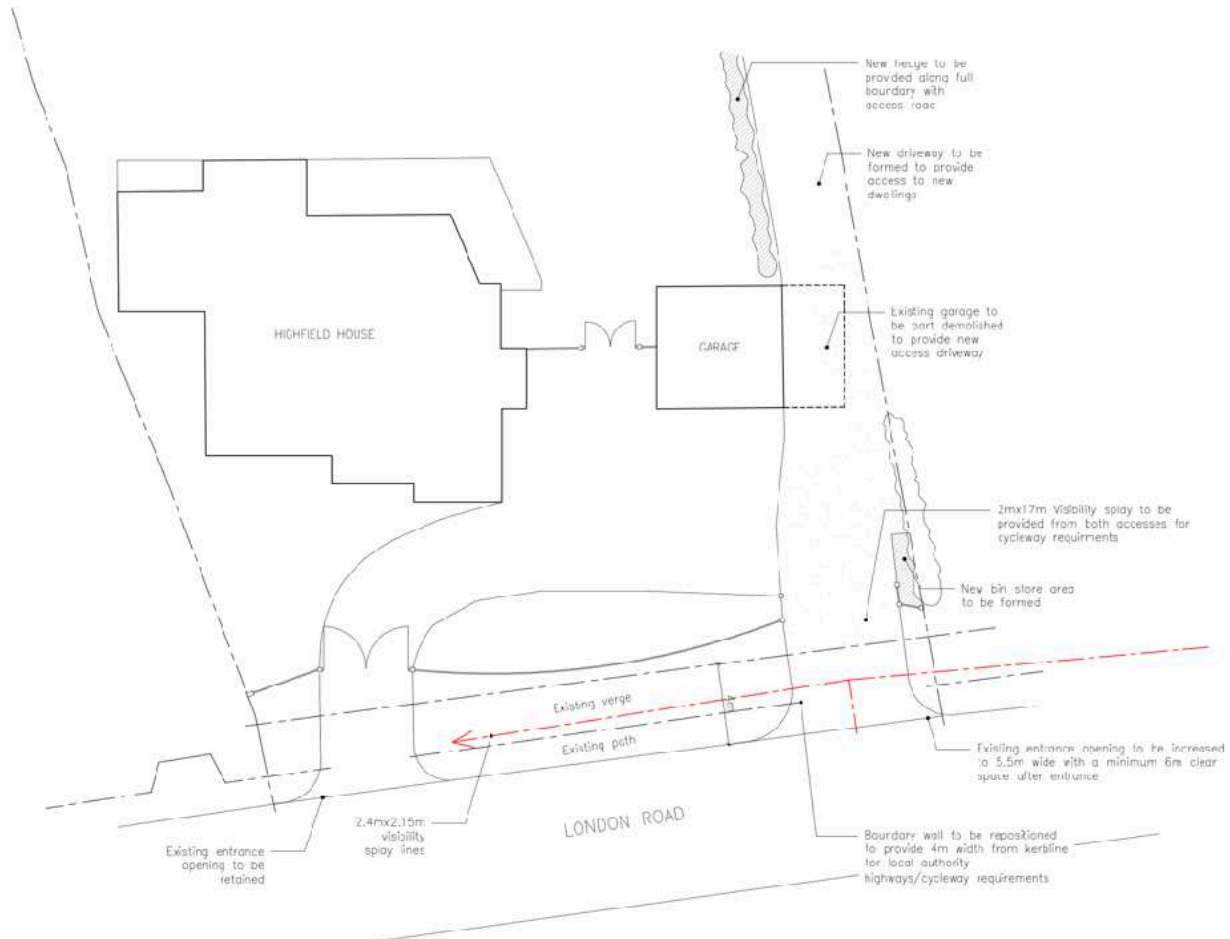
Site access to be made available to serve the proposed new dwellings to the right
